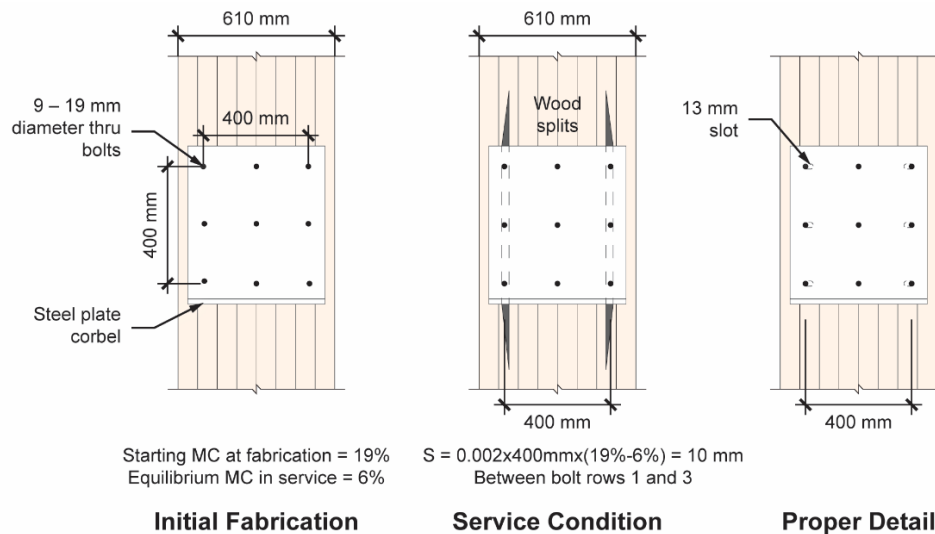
Damage caused by shrinkage (Encapsulated Mass Timber Const., 2021)
